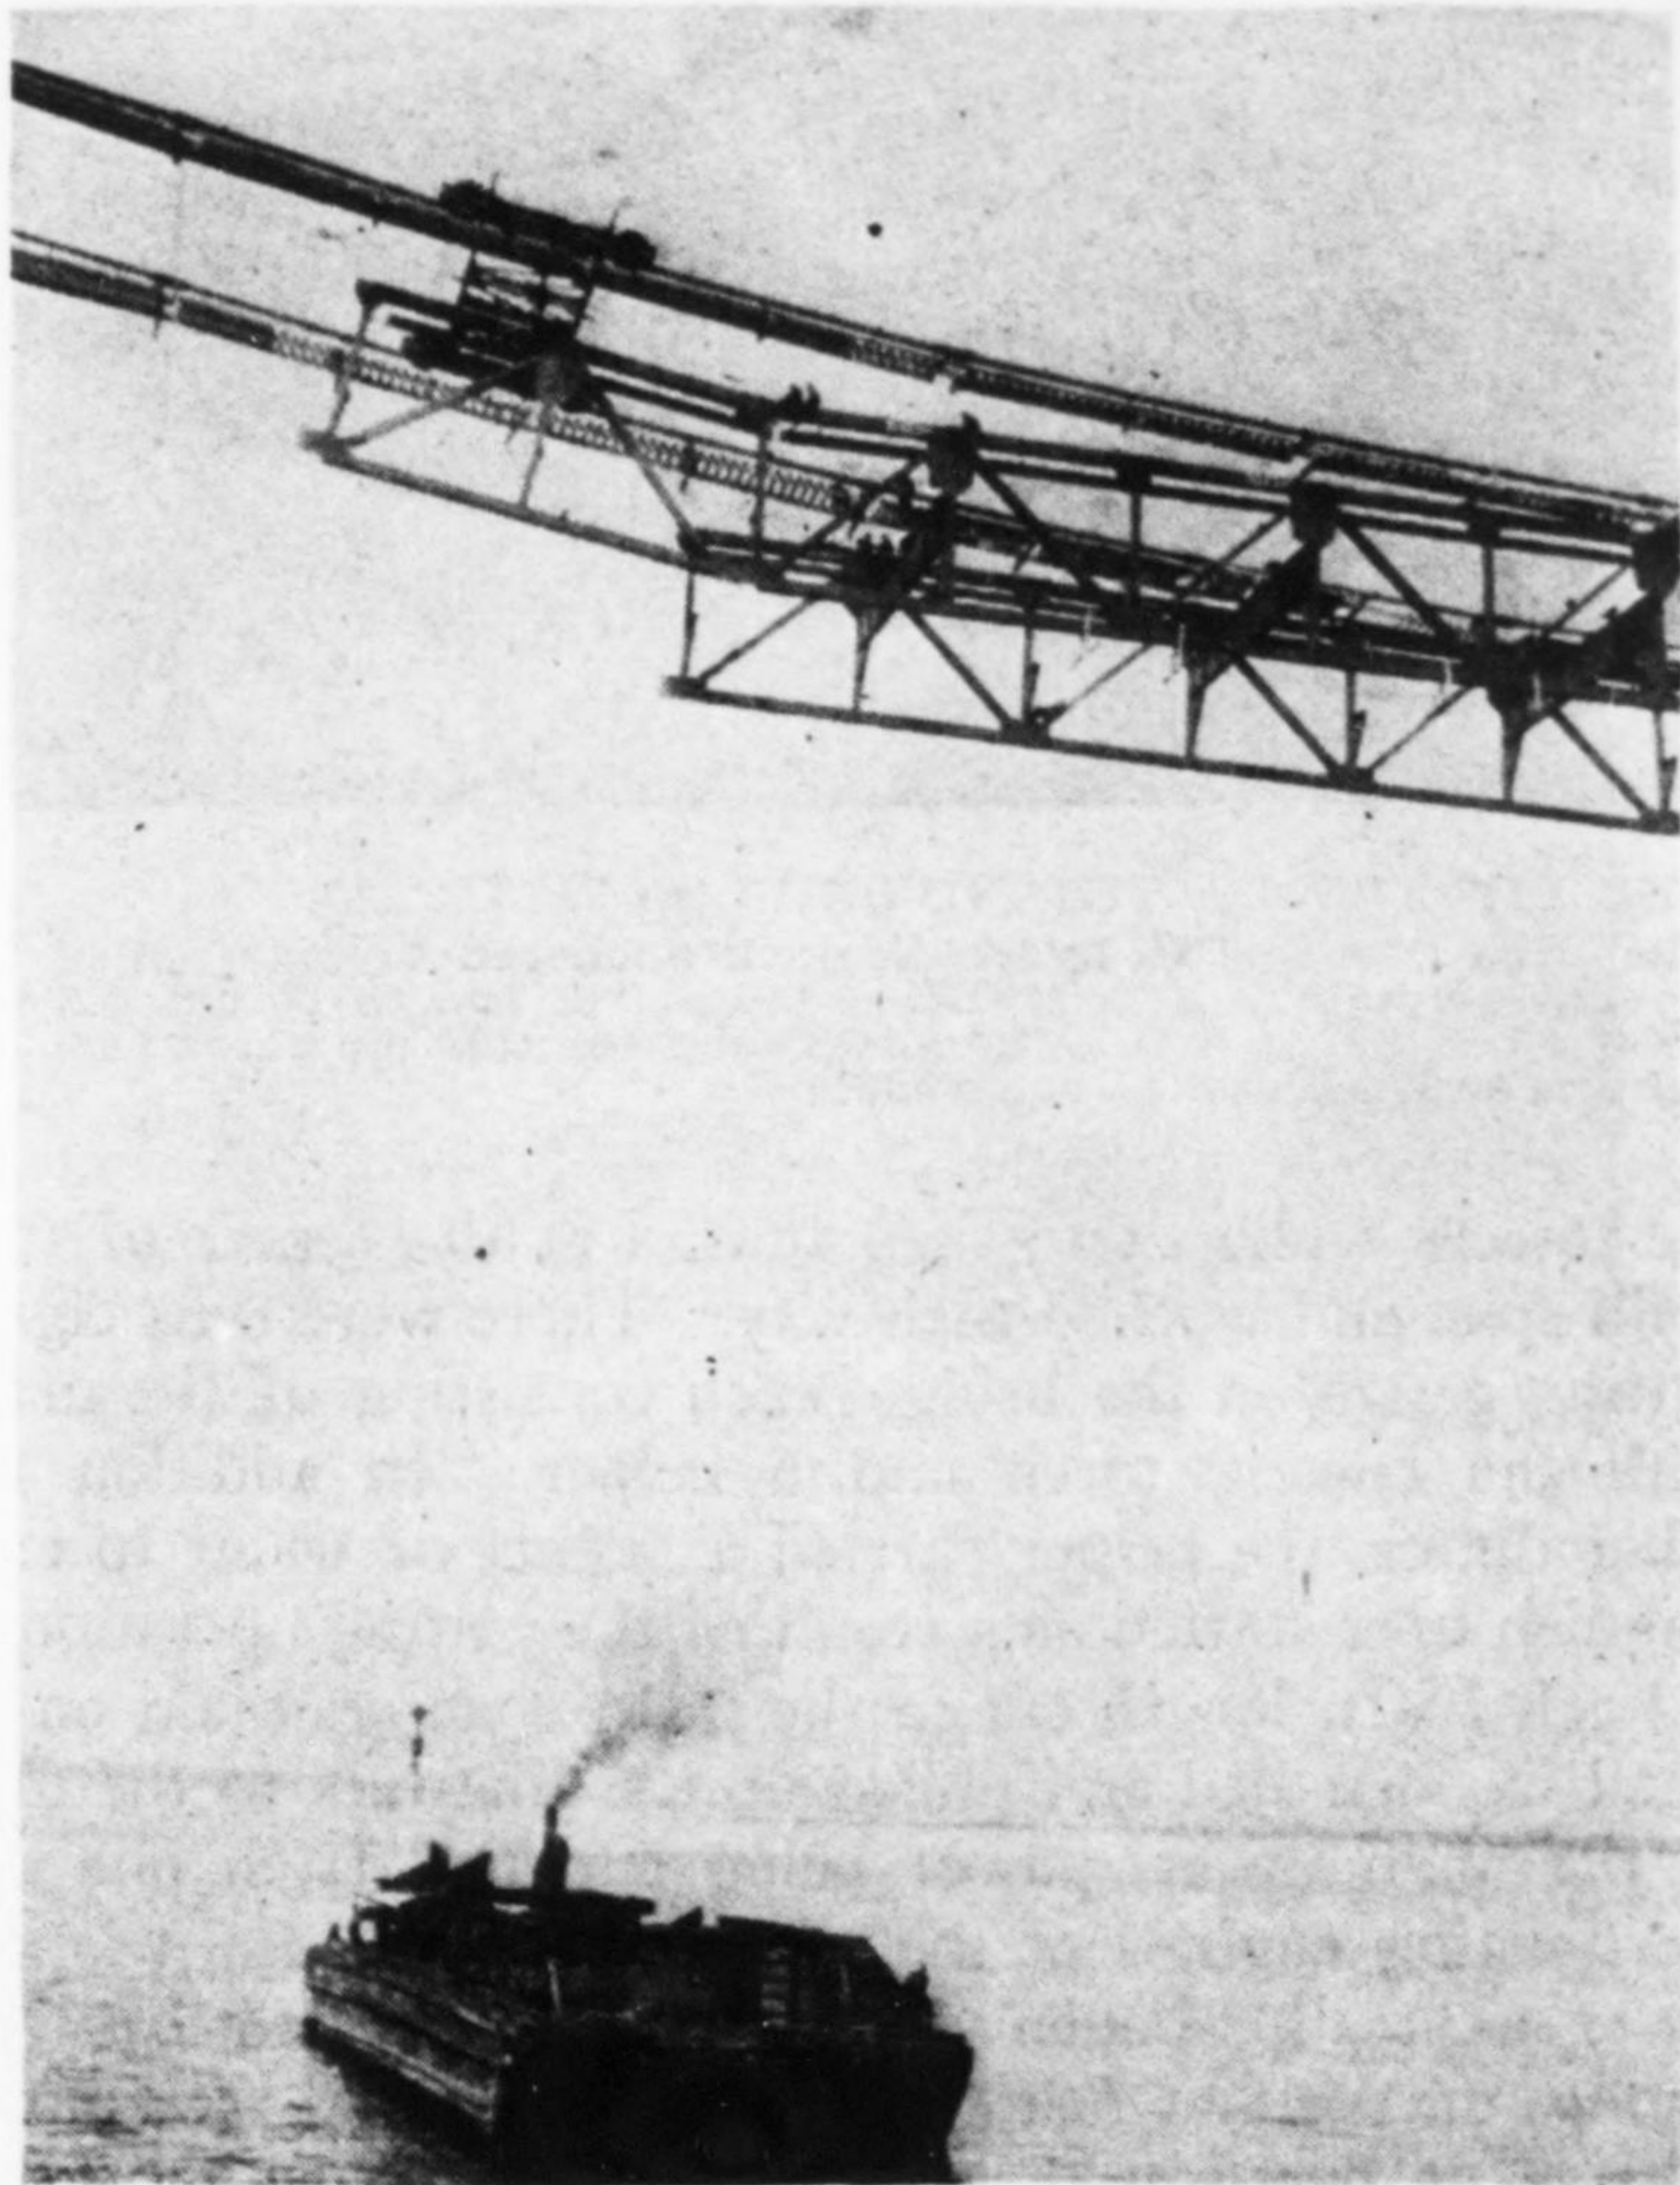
TRAVELER LIFTING TRUSS SECTION FREE OF SUSPENDERS, MOUNT HOPE
